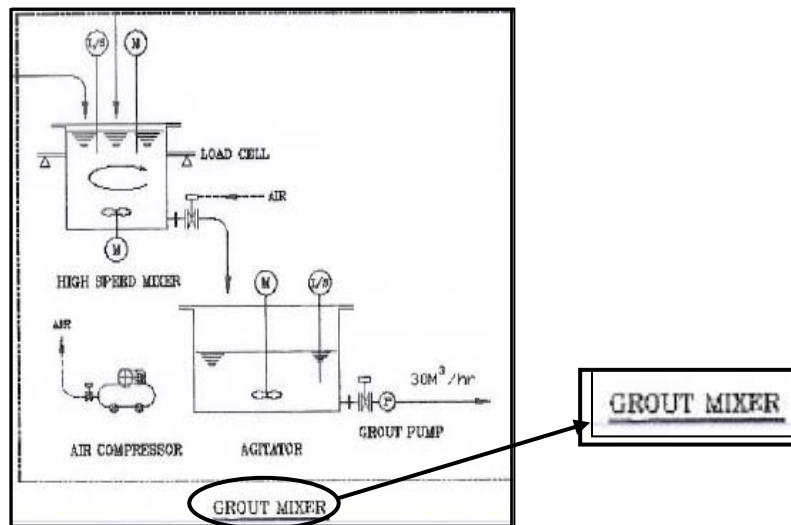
Partial view of contract specification for a 30 m³/hour grout-mixing plant
